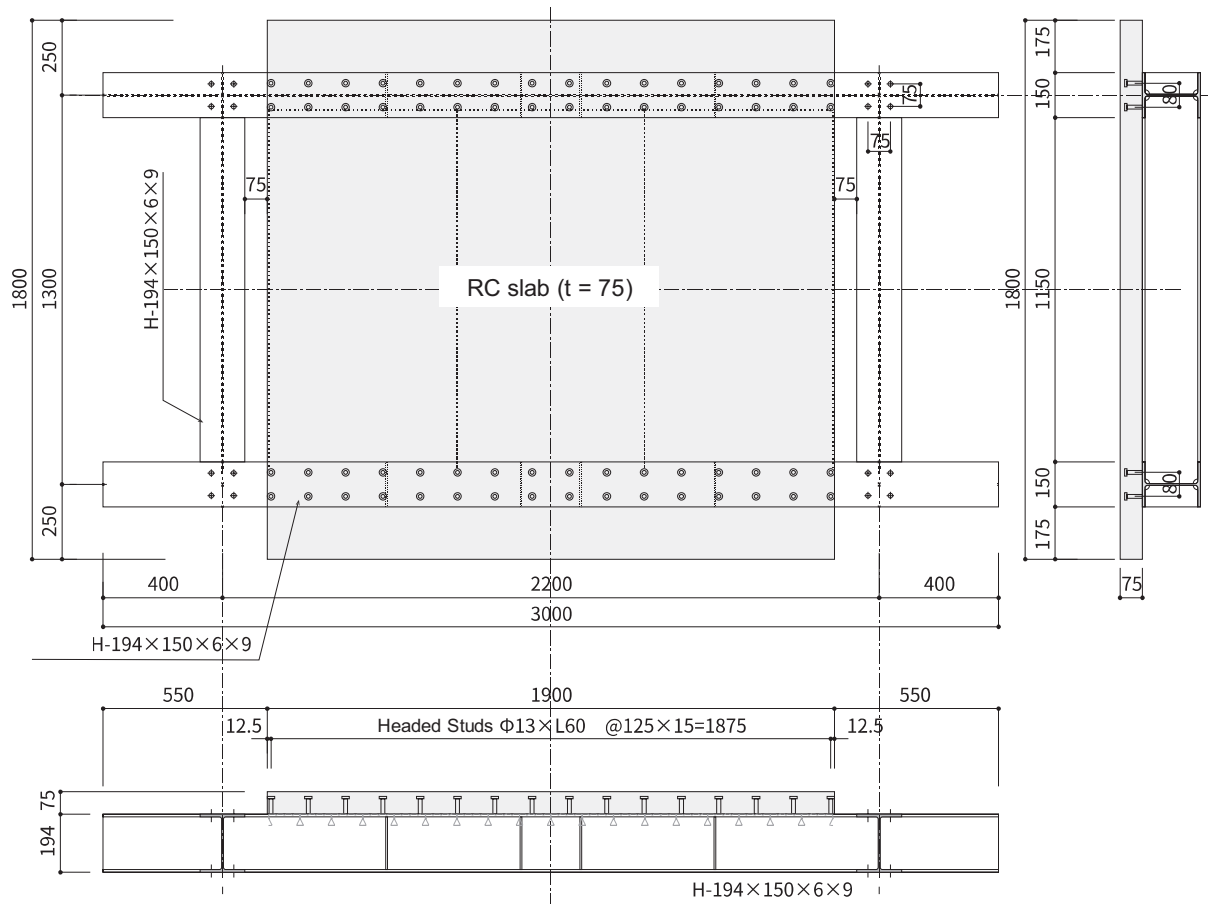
| Specimen (reinforced concrete slab) (mm).
